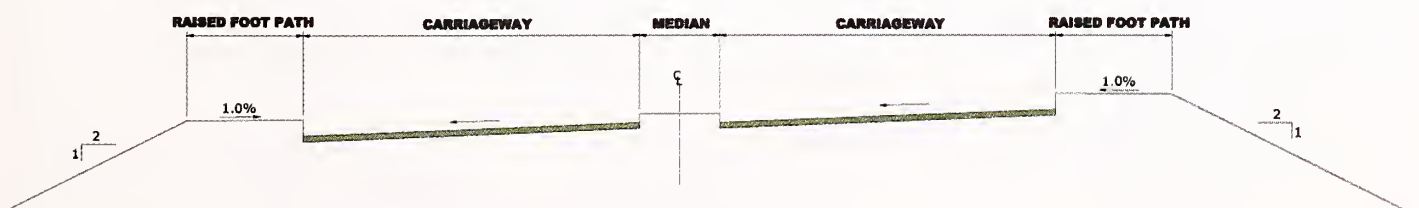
A Simplified Typical Cross-Section of Divided Carriageway in Super Elevated Section with Kerbs (Urban Situation)
